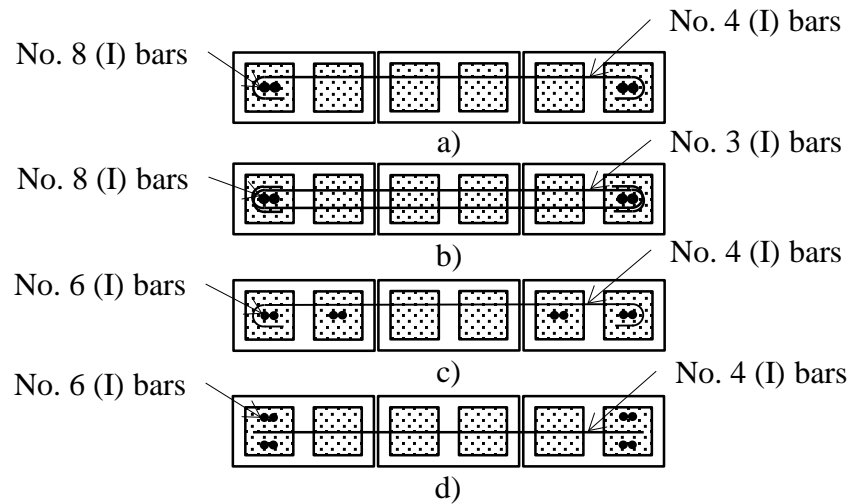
Reinforcement arrangement in pullout and wall splice specimens as tested by Mjelde – Modified from Mjelde (2008): a) centered No. 8 bars with single transverse reinforcement, b) centered No. 8 bars with double transverse reinforcement, c) centered No. 6 bars in the two outer cells with single transverse reinforcement, and d) two pairs of spliced No. 6 bars with single transverse reinforcement.
